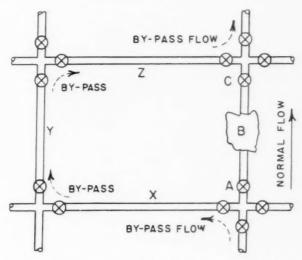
Arrangement for Bypassing a Break in a Typical City Block
